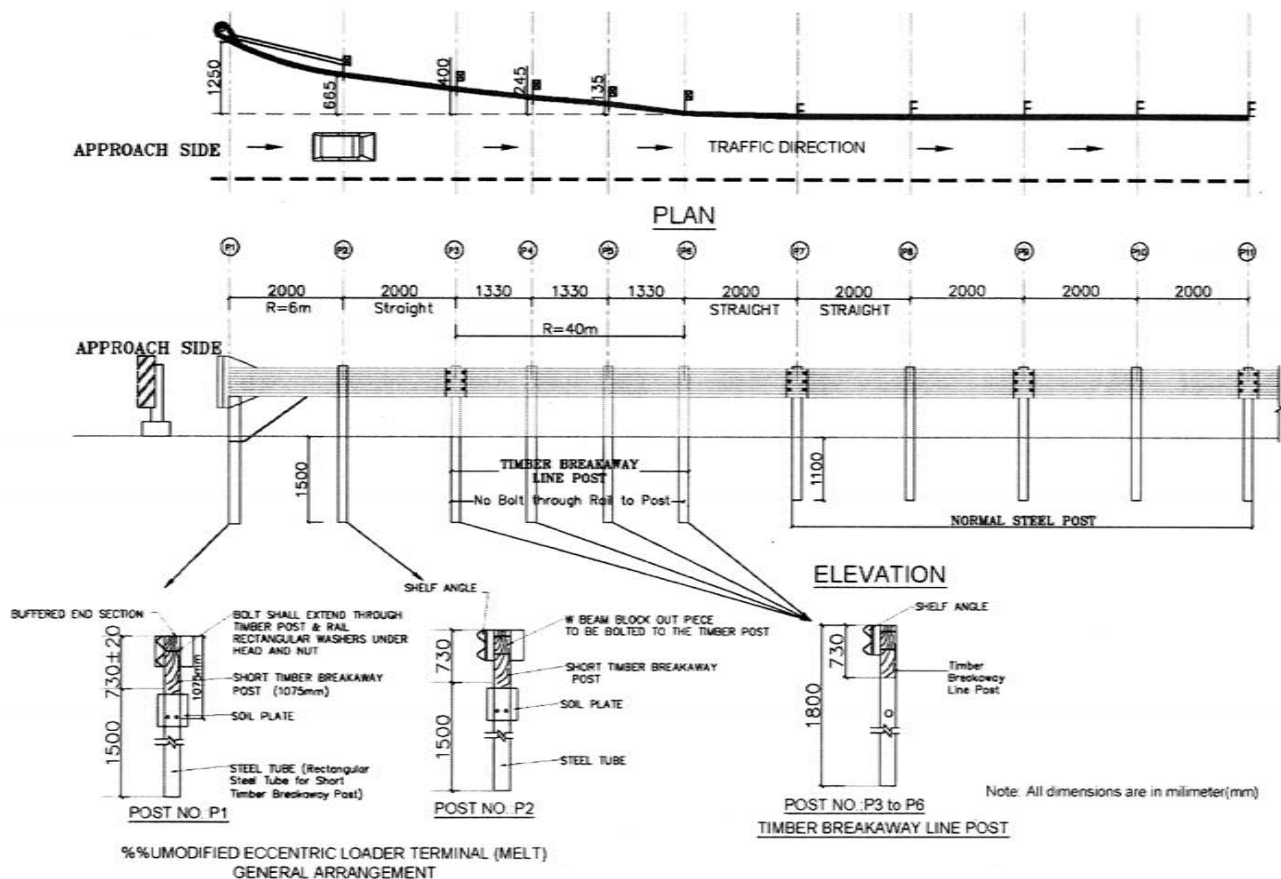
Fig. Modified eccentric Loader Terminal (MELT)
